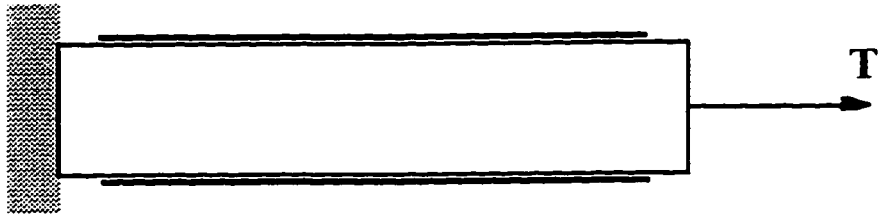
Uncracked Concrete Block - load carried by concrete
